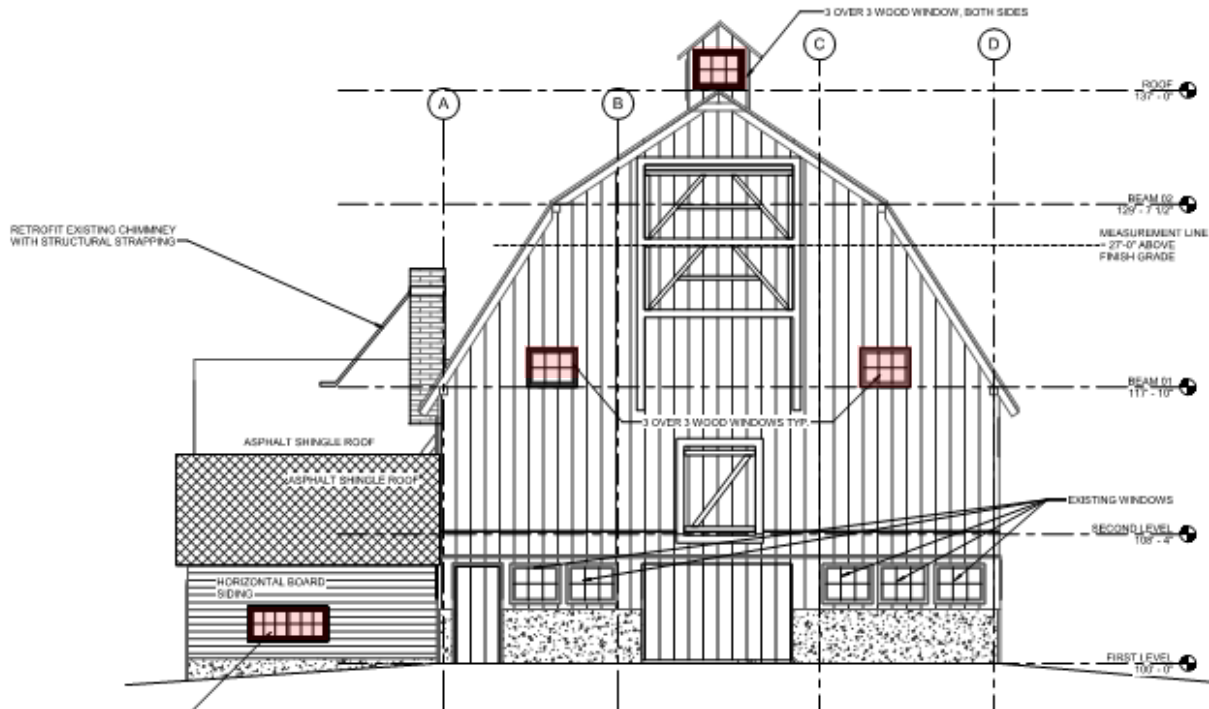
The 1941 Milking Parlor Addition Gambrel Roof sections to be removed (shaded red). North Elevation.
